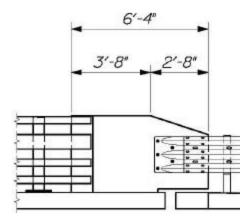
MaineDOT Type IA AGT concrete buttress section.
